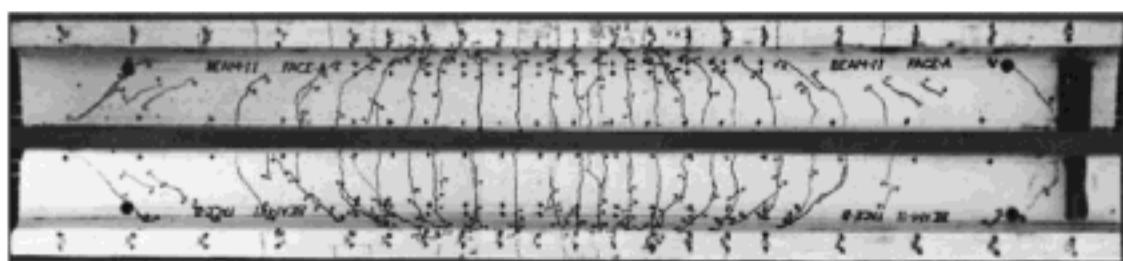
Flexural cracking in heavily reinforced beam. (Tests by Nawy, Potyondy, et al.)
